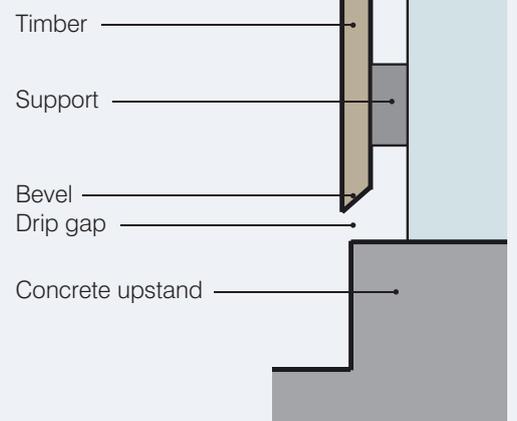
presents good practice with respect to preventing water ingress into a bare timber clad wall. A flashing is used on the upward facing elevation of the elements to protect the end grain, a clear drip space is left at the base which allows water run-off, the timber façade is lifted from the ground on a concrete plinth to prevent splash-back of rain on the ground surface, and the base of the boards are bevelled to form a drip line.
